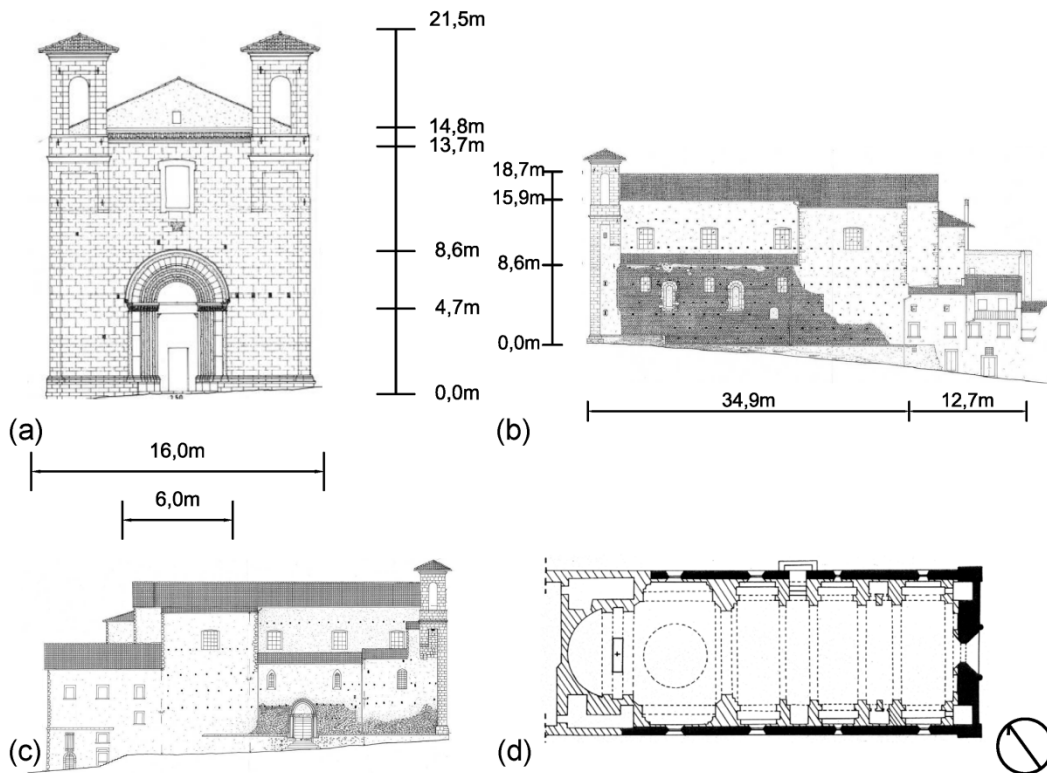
San Marco church: (a-b-c) façade, north and south side, (d) plan (Silva et al. 2011).
